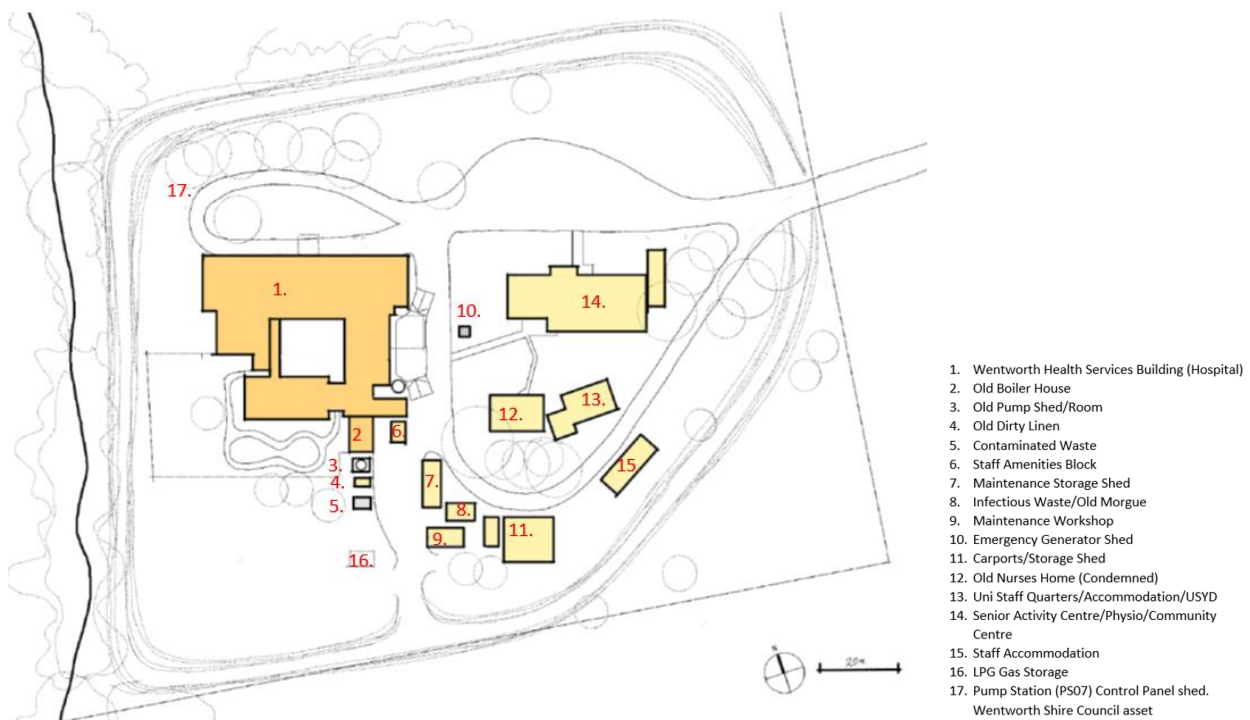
Existing buildings on the Wentworth Hospital site (HI)
